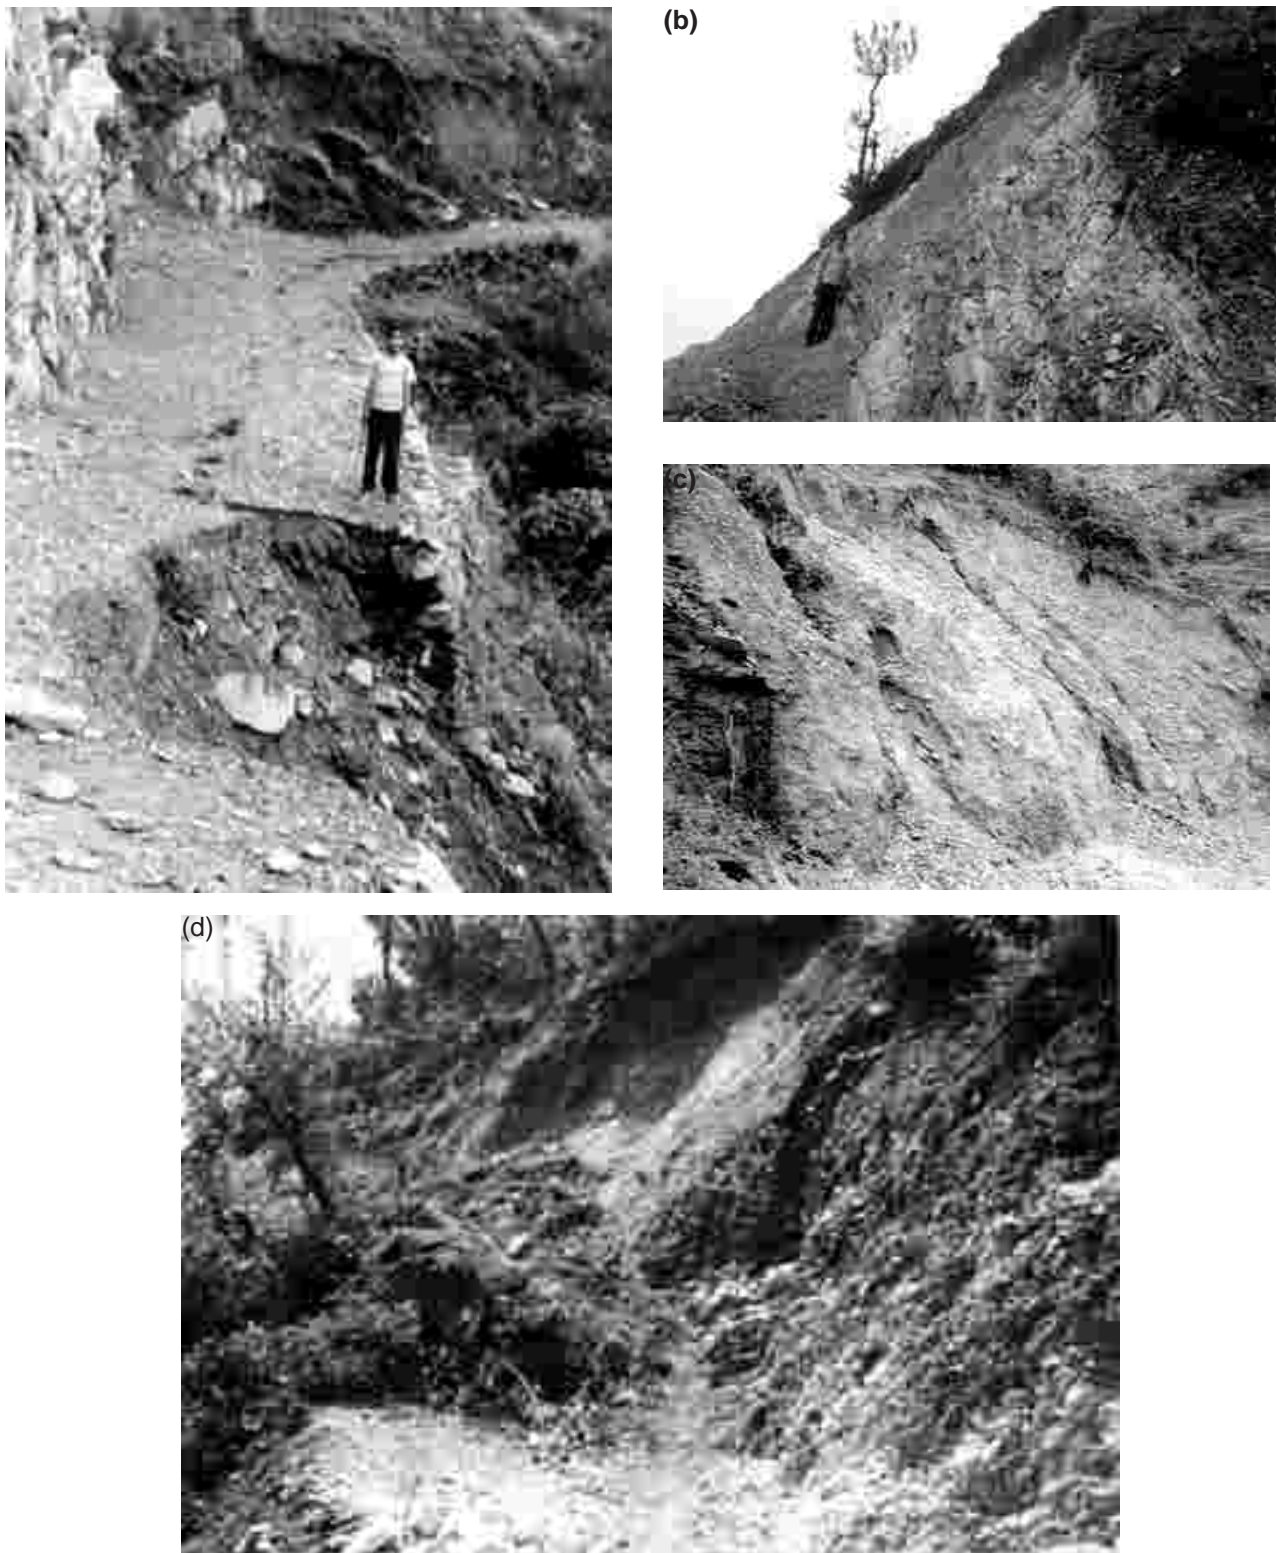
Photographs showing proposed sites for bioengineering: (a) Site B1 showing damaged road segment; view towards southeast, (b) Site B5 showing steep rock slope containing mica-schist and quartzite bedrock; view towards east, (c) Site B7 showing soil slide with distinct gully erosion; view towards southeast and (d) Site B8 showing debris slide on weathered quartzite and phyllite; view towards east
